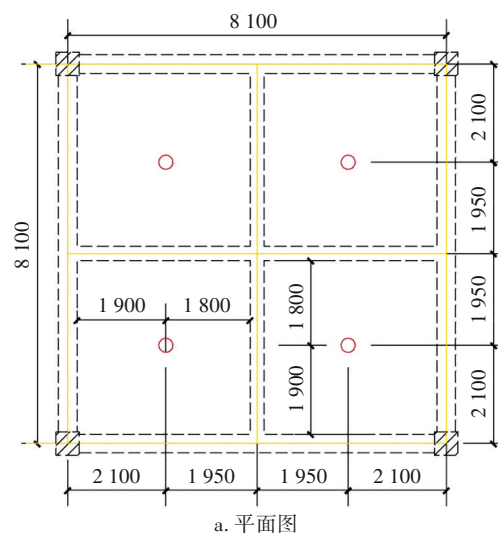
Schematic diagram of sprinkler arrangement under cross-laid single-girder floor
